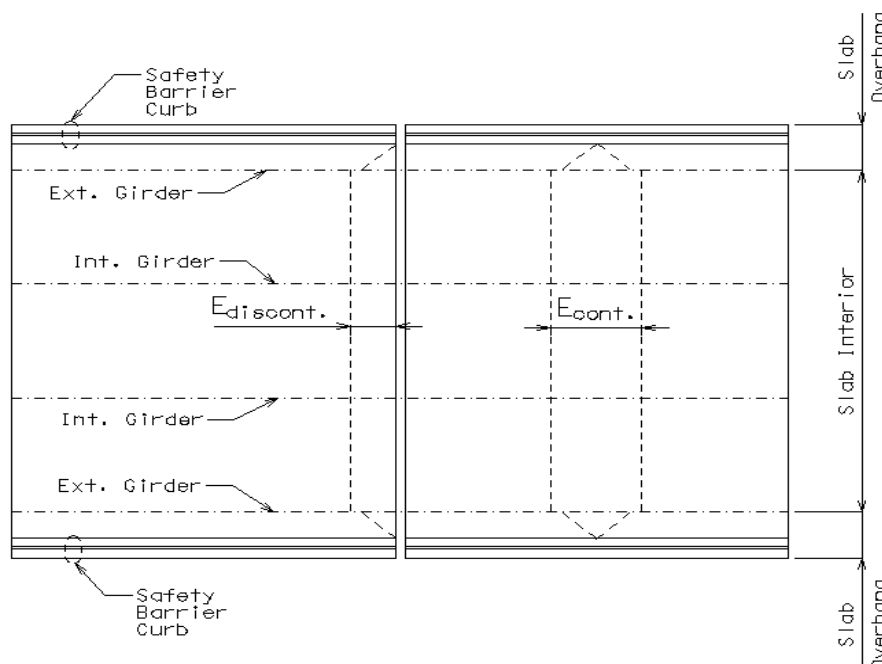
Plan View of Bridge Showing Equivalent Strip Width for Continuous and Discontinuous Slab Sections
